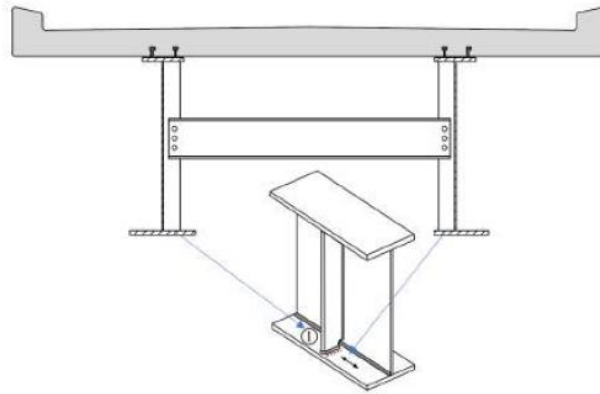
HFMI-treated welded detail for fatigue verification in road bridge
